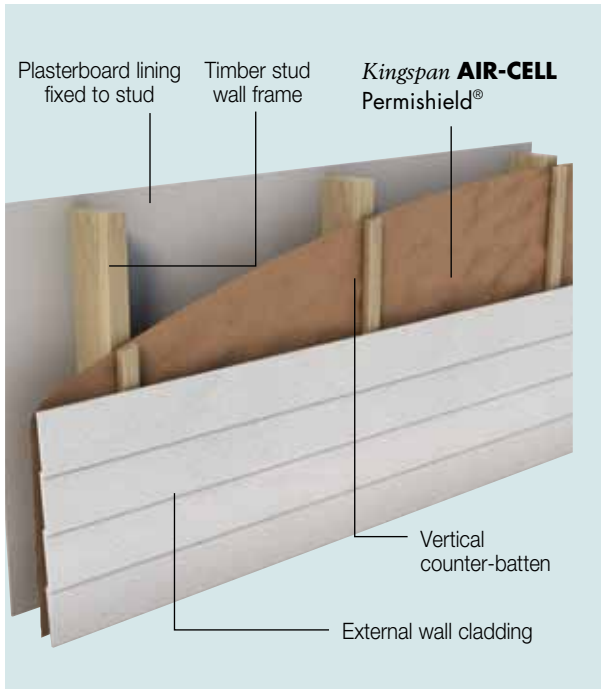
Kingspan AIR-CELL Permishield® in a timber-framed wall installation using counter-battens
